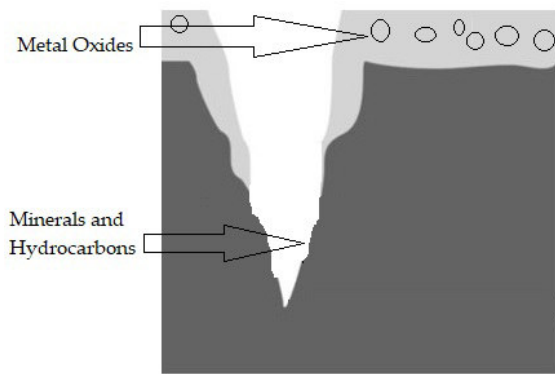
Schematic diagram showing the cross sectional view in a road pavement crack.
